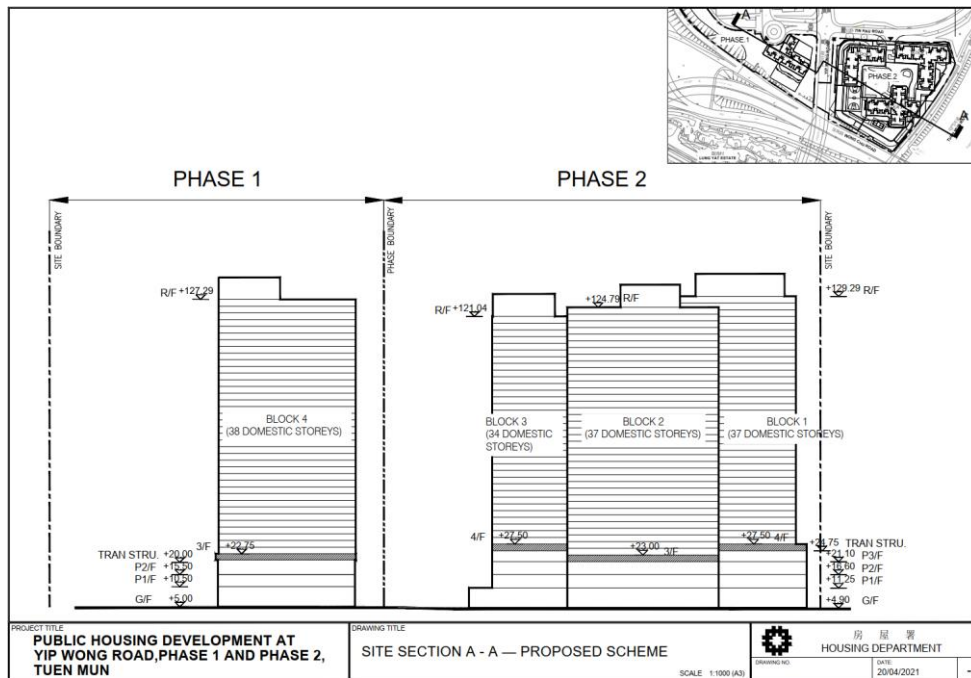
Indicative Plan of Proposed Scheme – Section A-A
